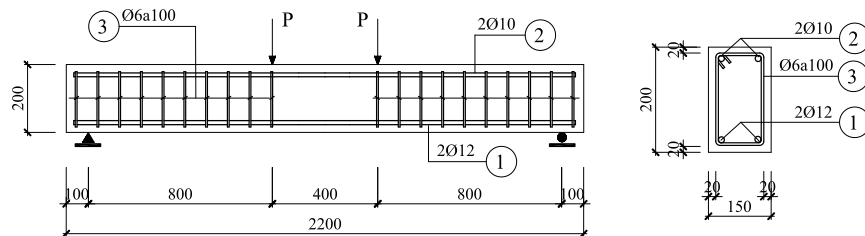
Dimensions and reinforcement details of D-1 and D-2 beam specimens
